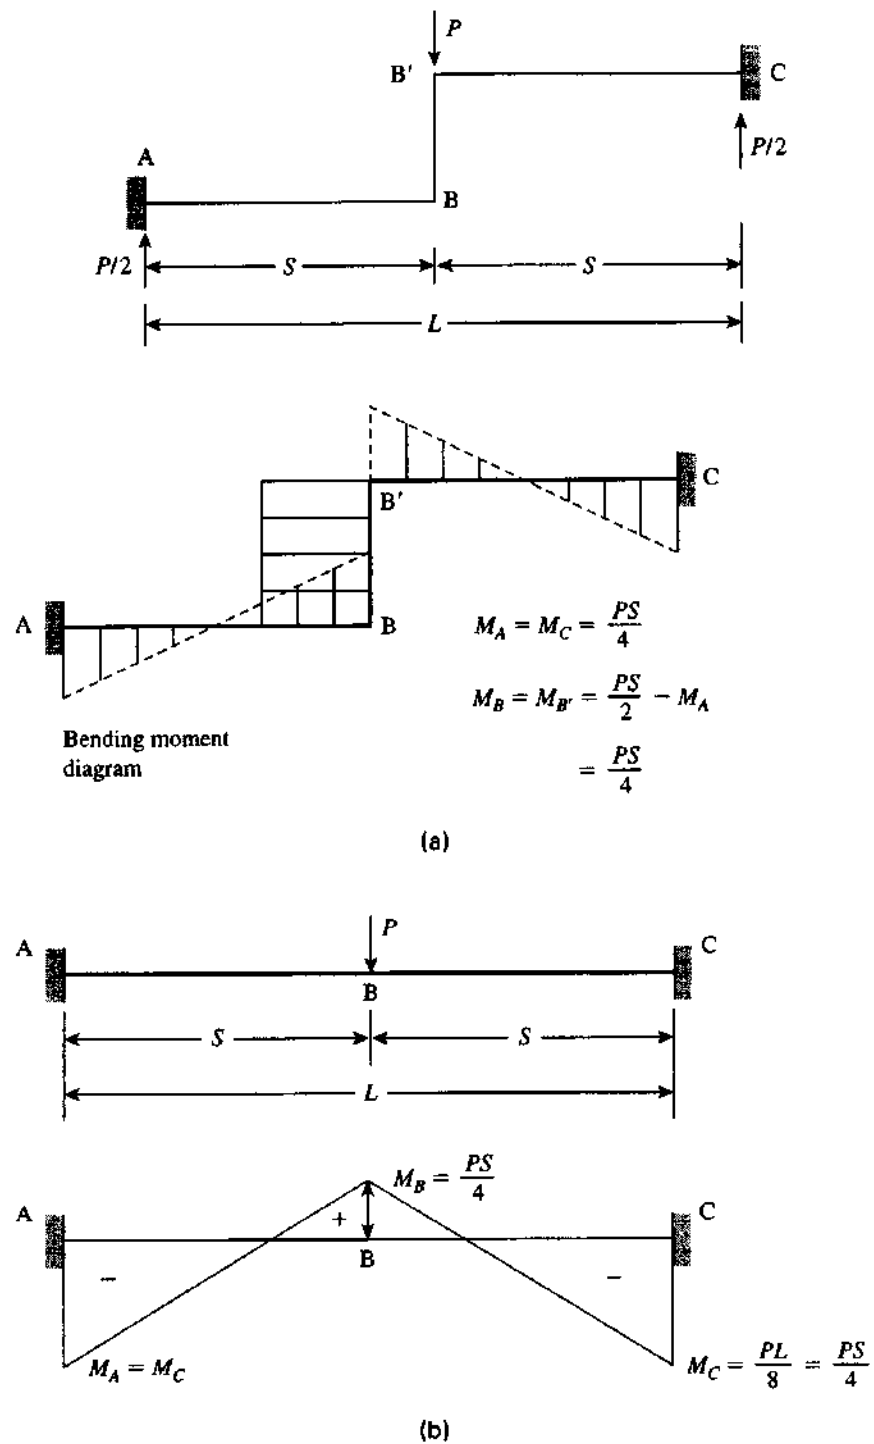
Fixed-end staircase: (a) loaded steps and (b) loaded beam.
